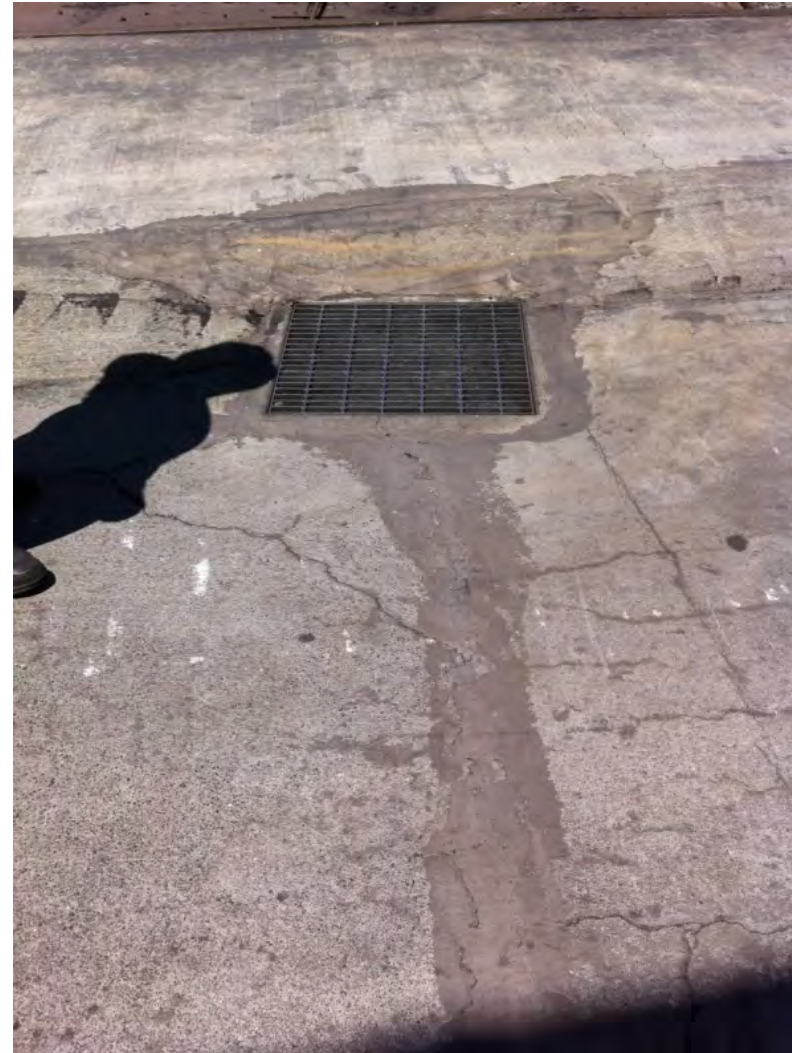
Looking west toward drain inlet 3DI-11A: Seams and cracking surrounding inlet sealed in December 2013.
